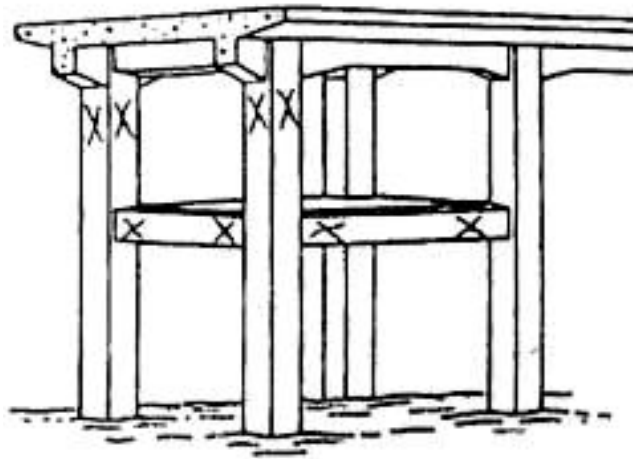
Cracking in columns and beams due to an earthquake
